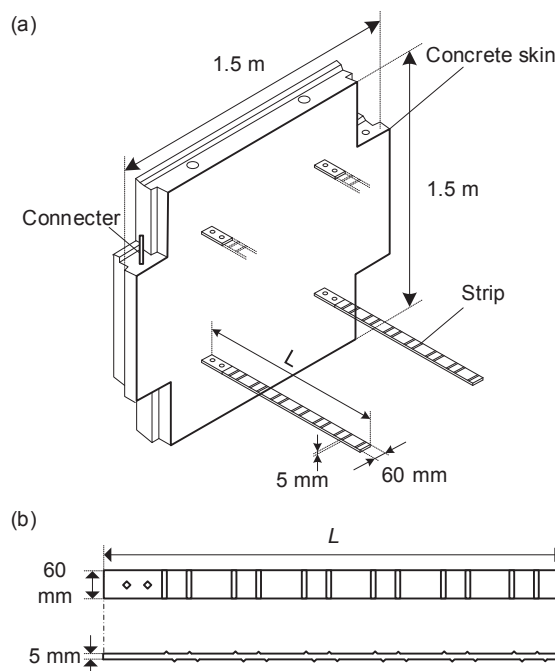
Schematic drawing of facing and strip in reinforced earth wall (Modified after PWRI, 2014).  $L$  means the length of reinforcement.
